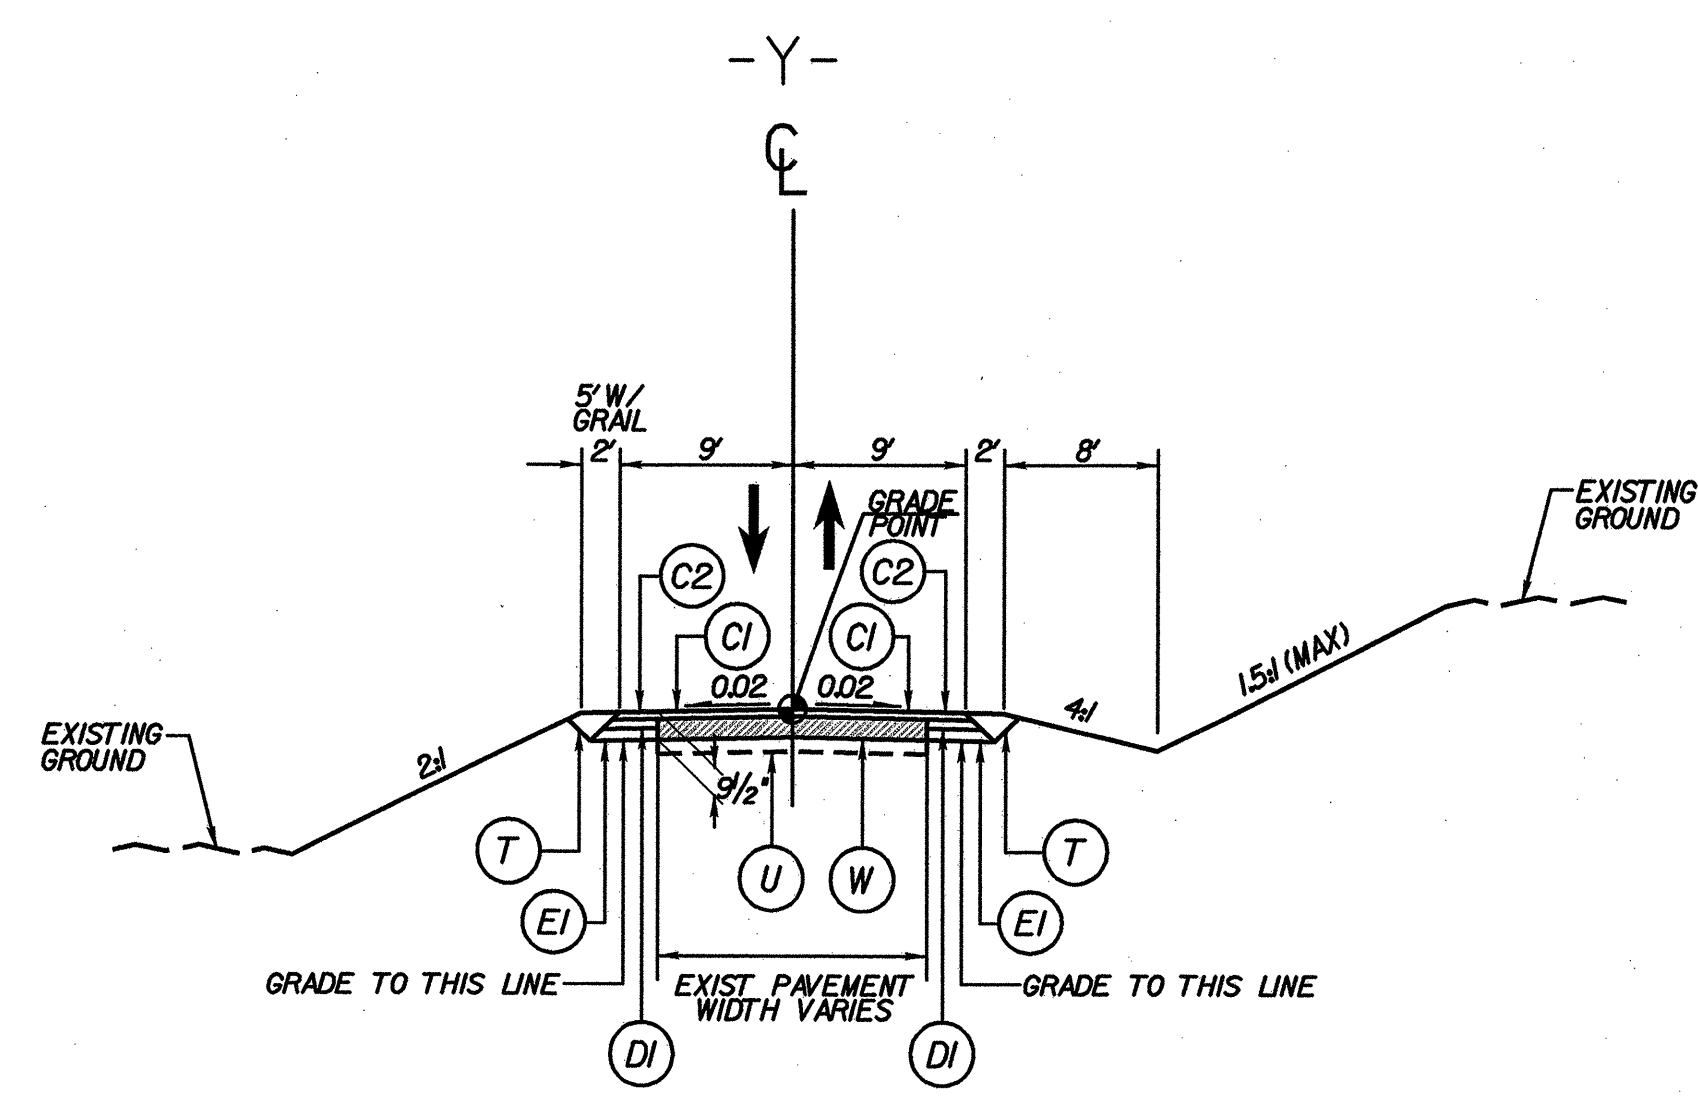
SHOWING TIE-INS AT PROJECT TERMINI
